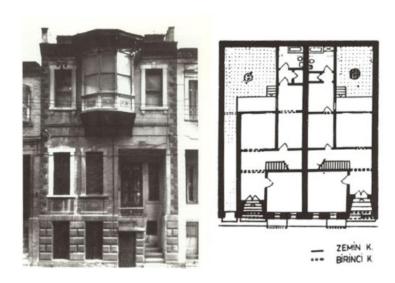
A Levantine house at Mithatpaşa Street and a Levantine house plan (Akyüz, 1994, 33)
